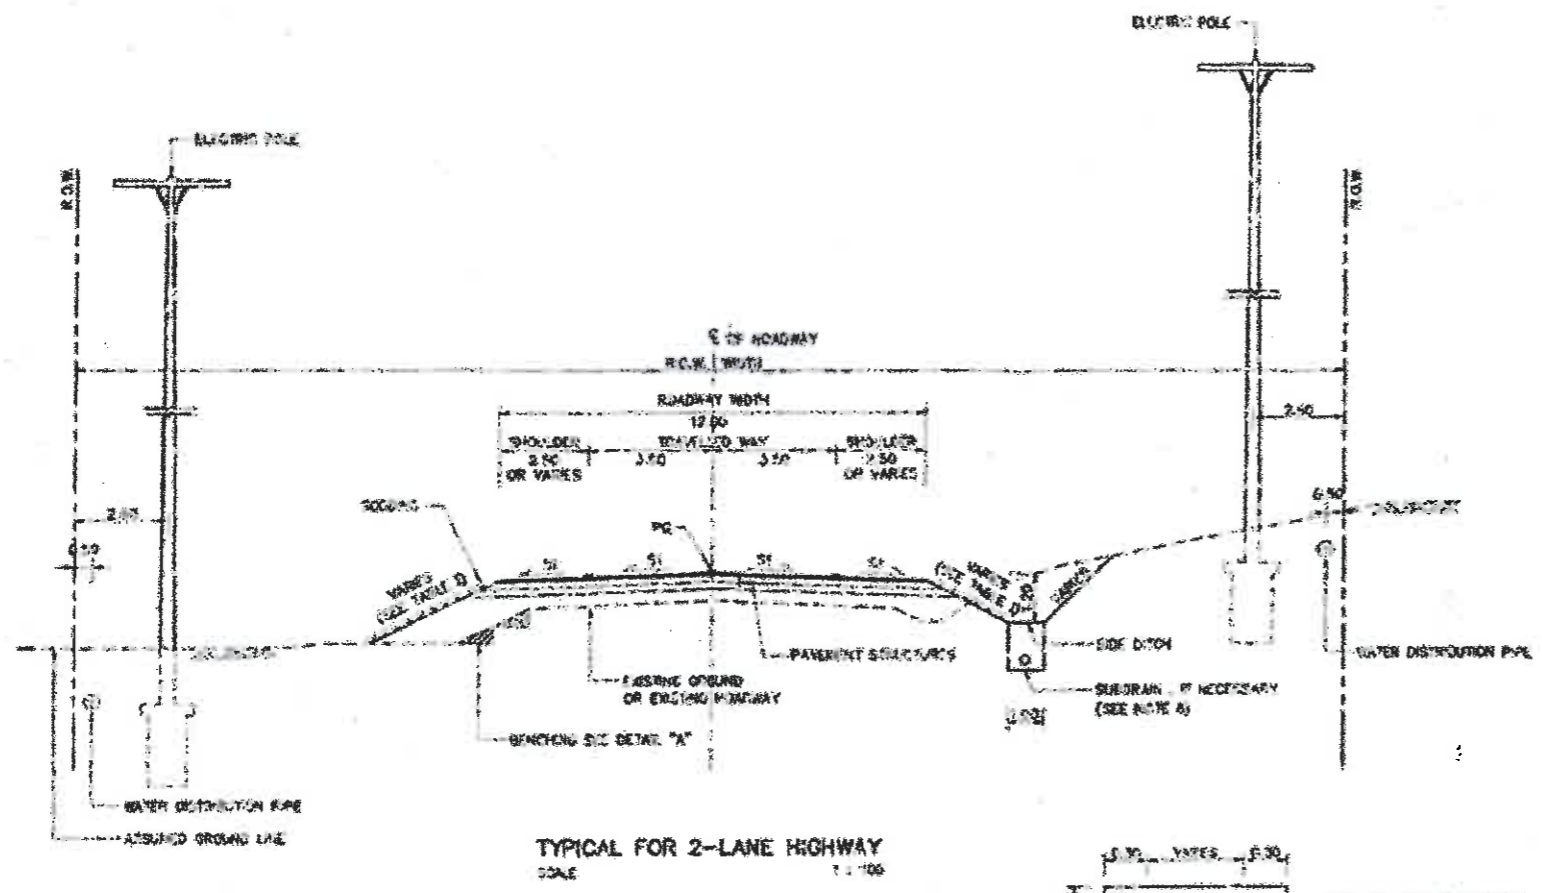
FIGURE IV : TYPICAL CROSS-SECTION FOR R.O.W. 14.00 M. MIN. (ALTERNATIVE II)
